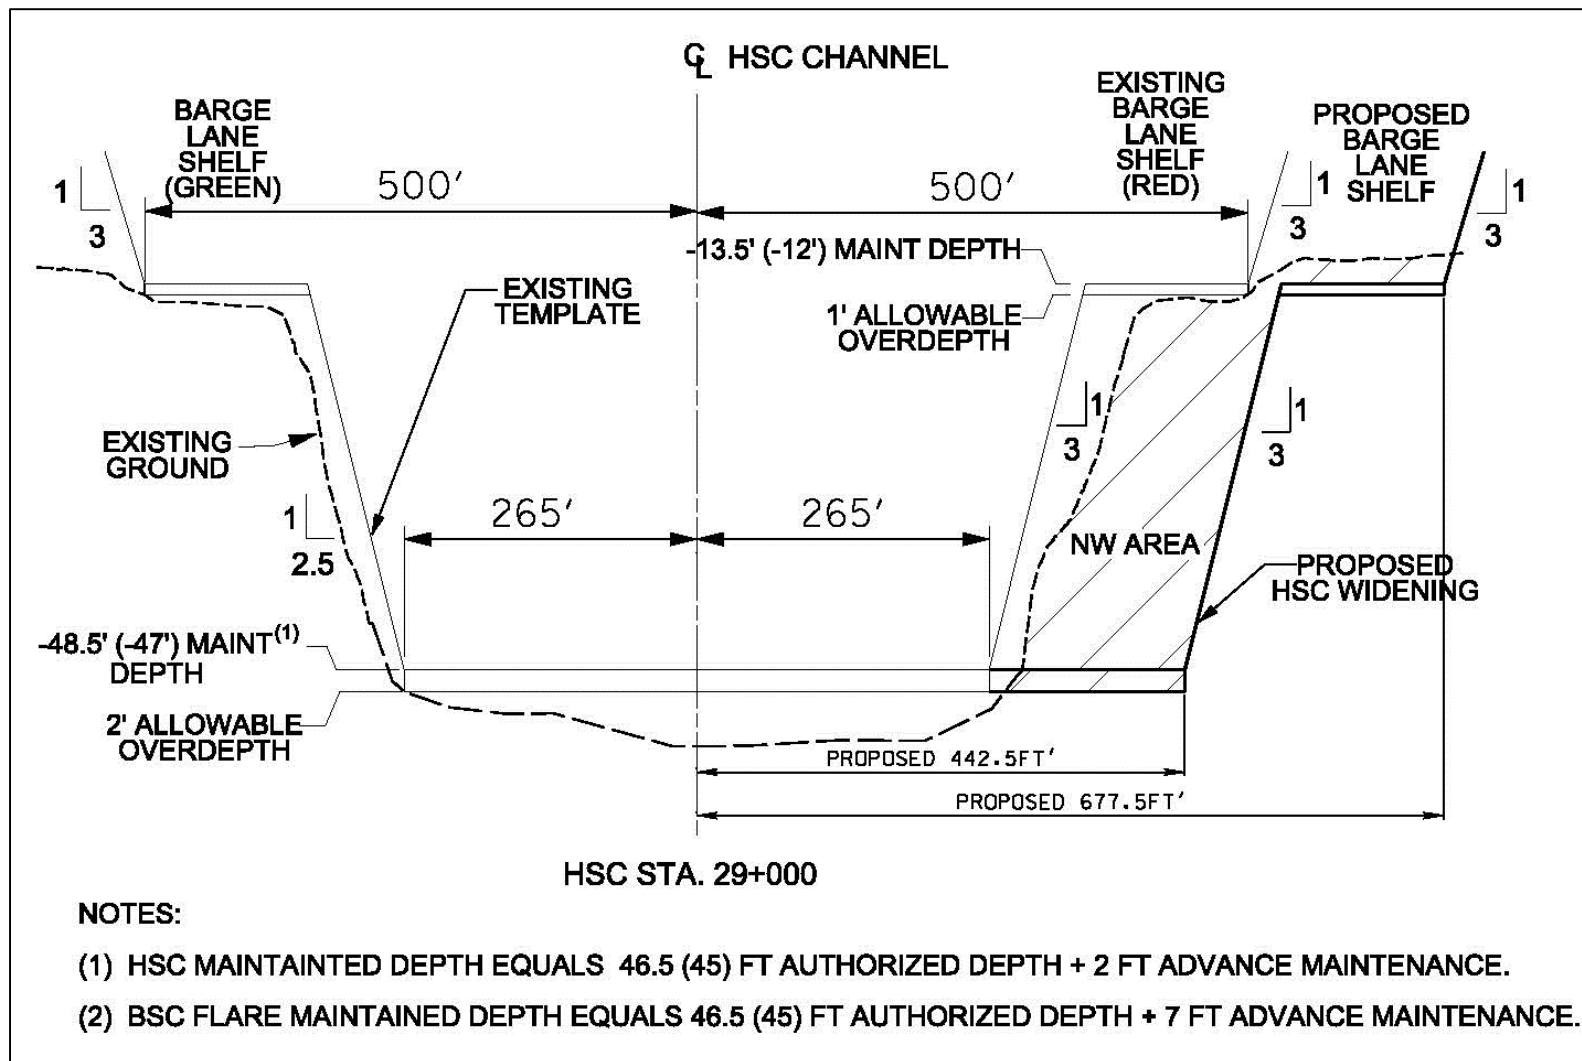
Cross Section of 235-foot Bend Easing on east side of HSC (Alternative 3; Corrective action)
